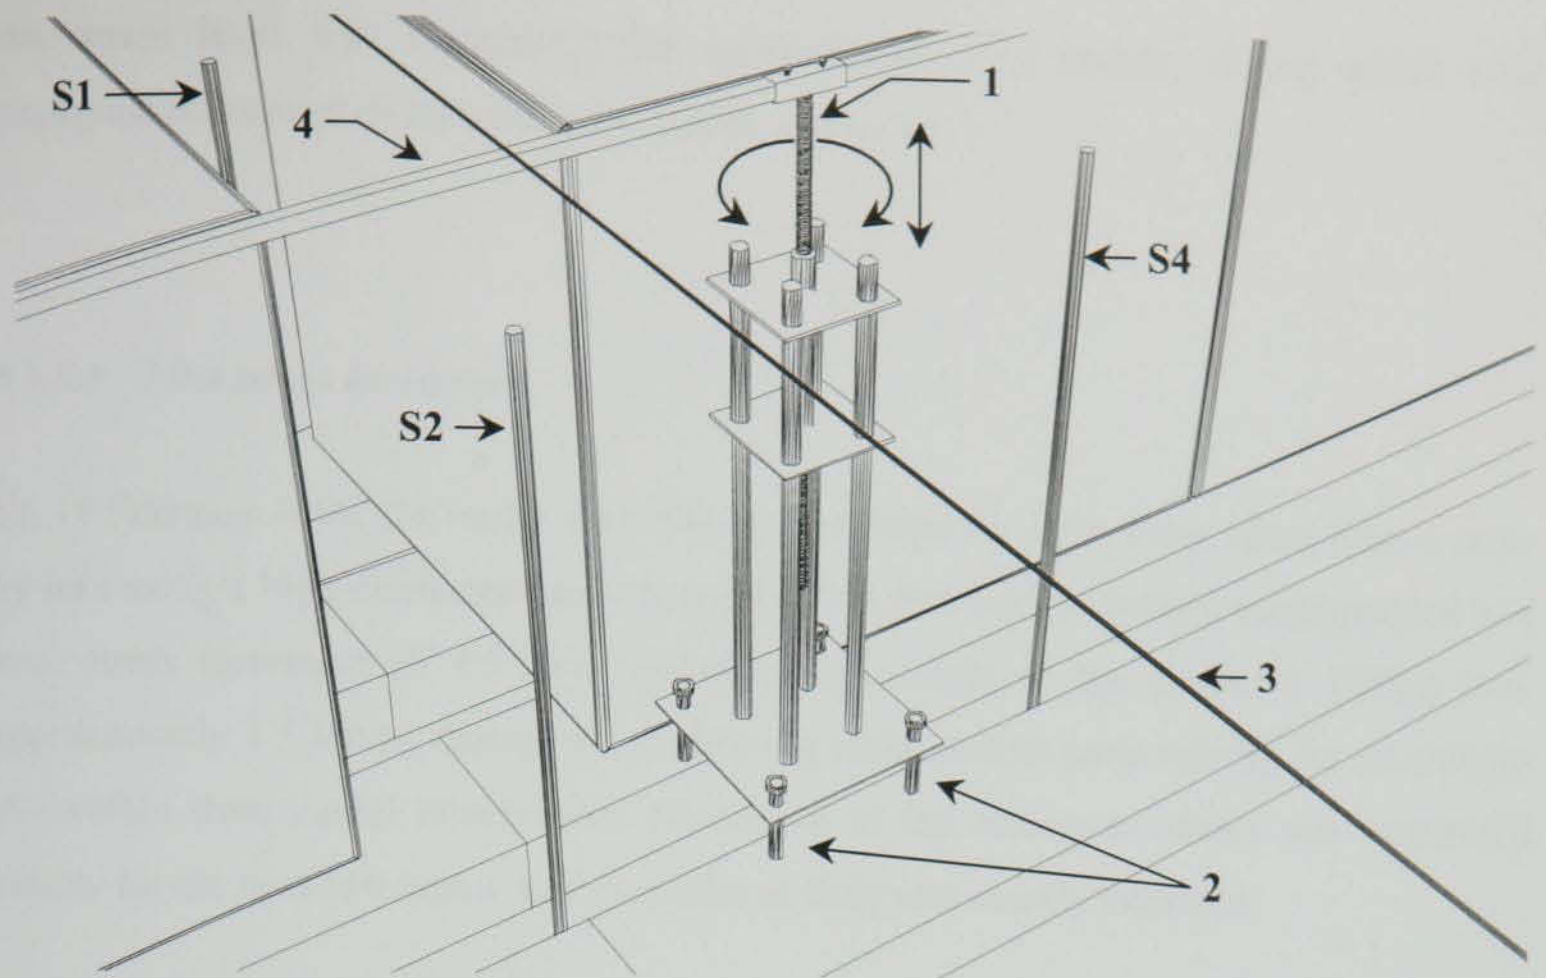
Detail of adjustable datum: (1) Vertical adjustment (2) Levelling bolts (3) Datum wire (4) Aluminium section
